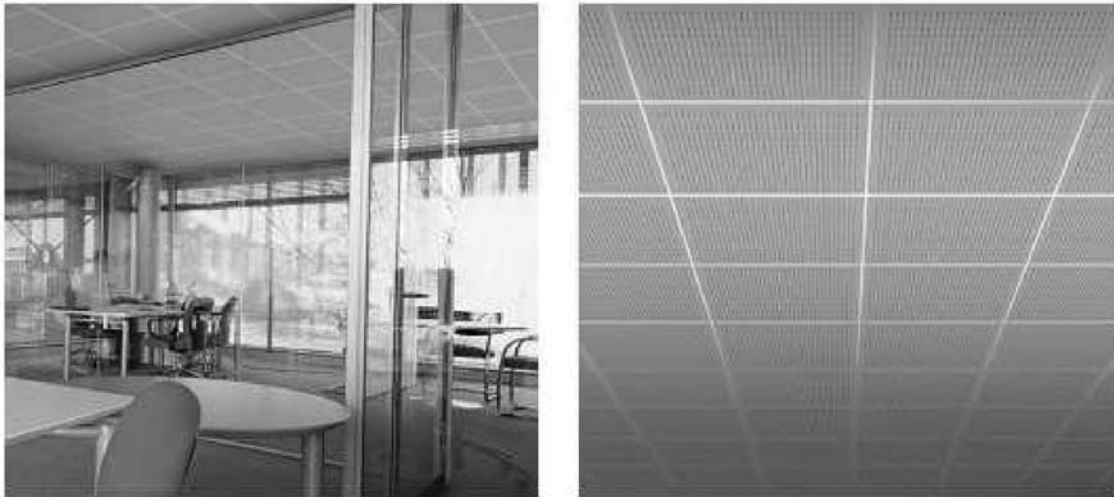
Application of wood-based perforated panels as a ceiling and wall covering [from 7].
